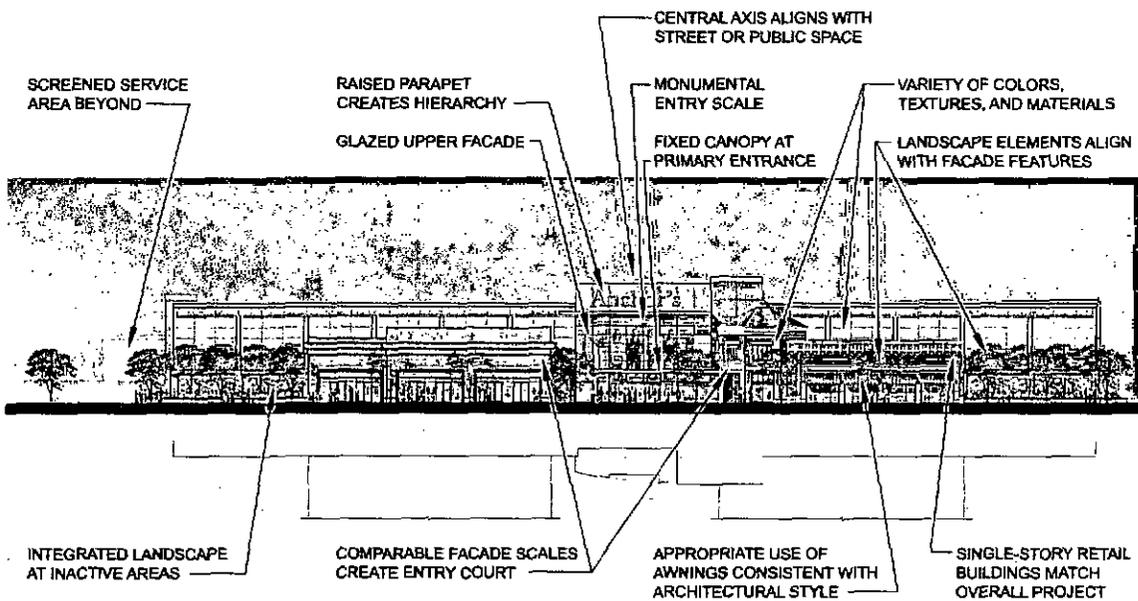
Department Store Façade Example (Combination of Mercantile Street and Cross Street Frontage)
